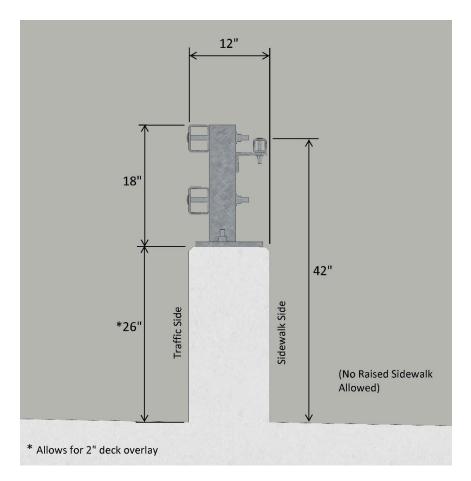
Iowa DOT "Modified B-25 Series" TL-3/4 separation railing (see Project No. BRF-028-2(45)--38-77, Design No. 125 Polk for a railing application)
